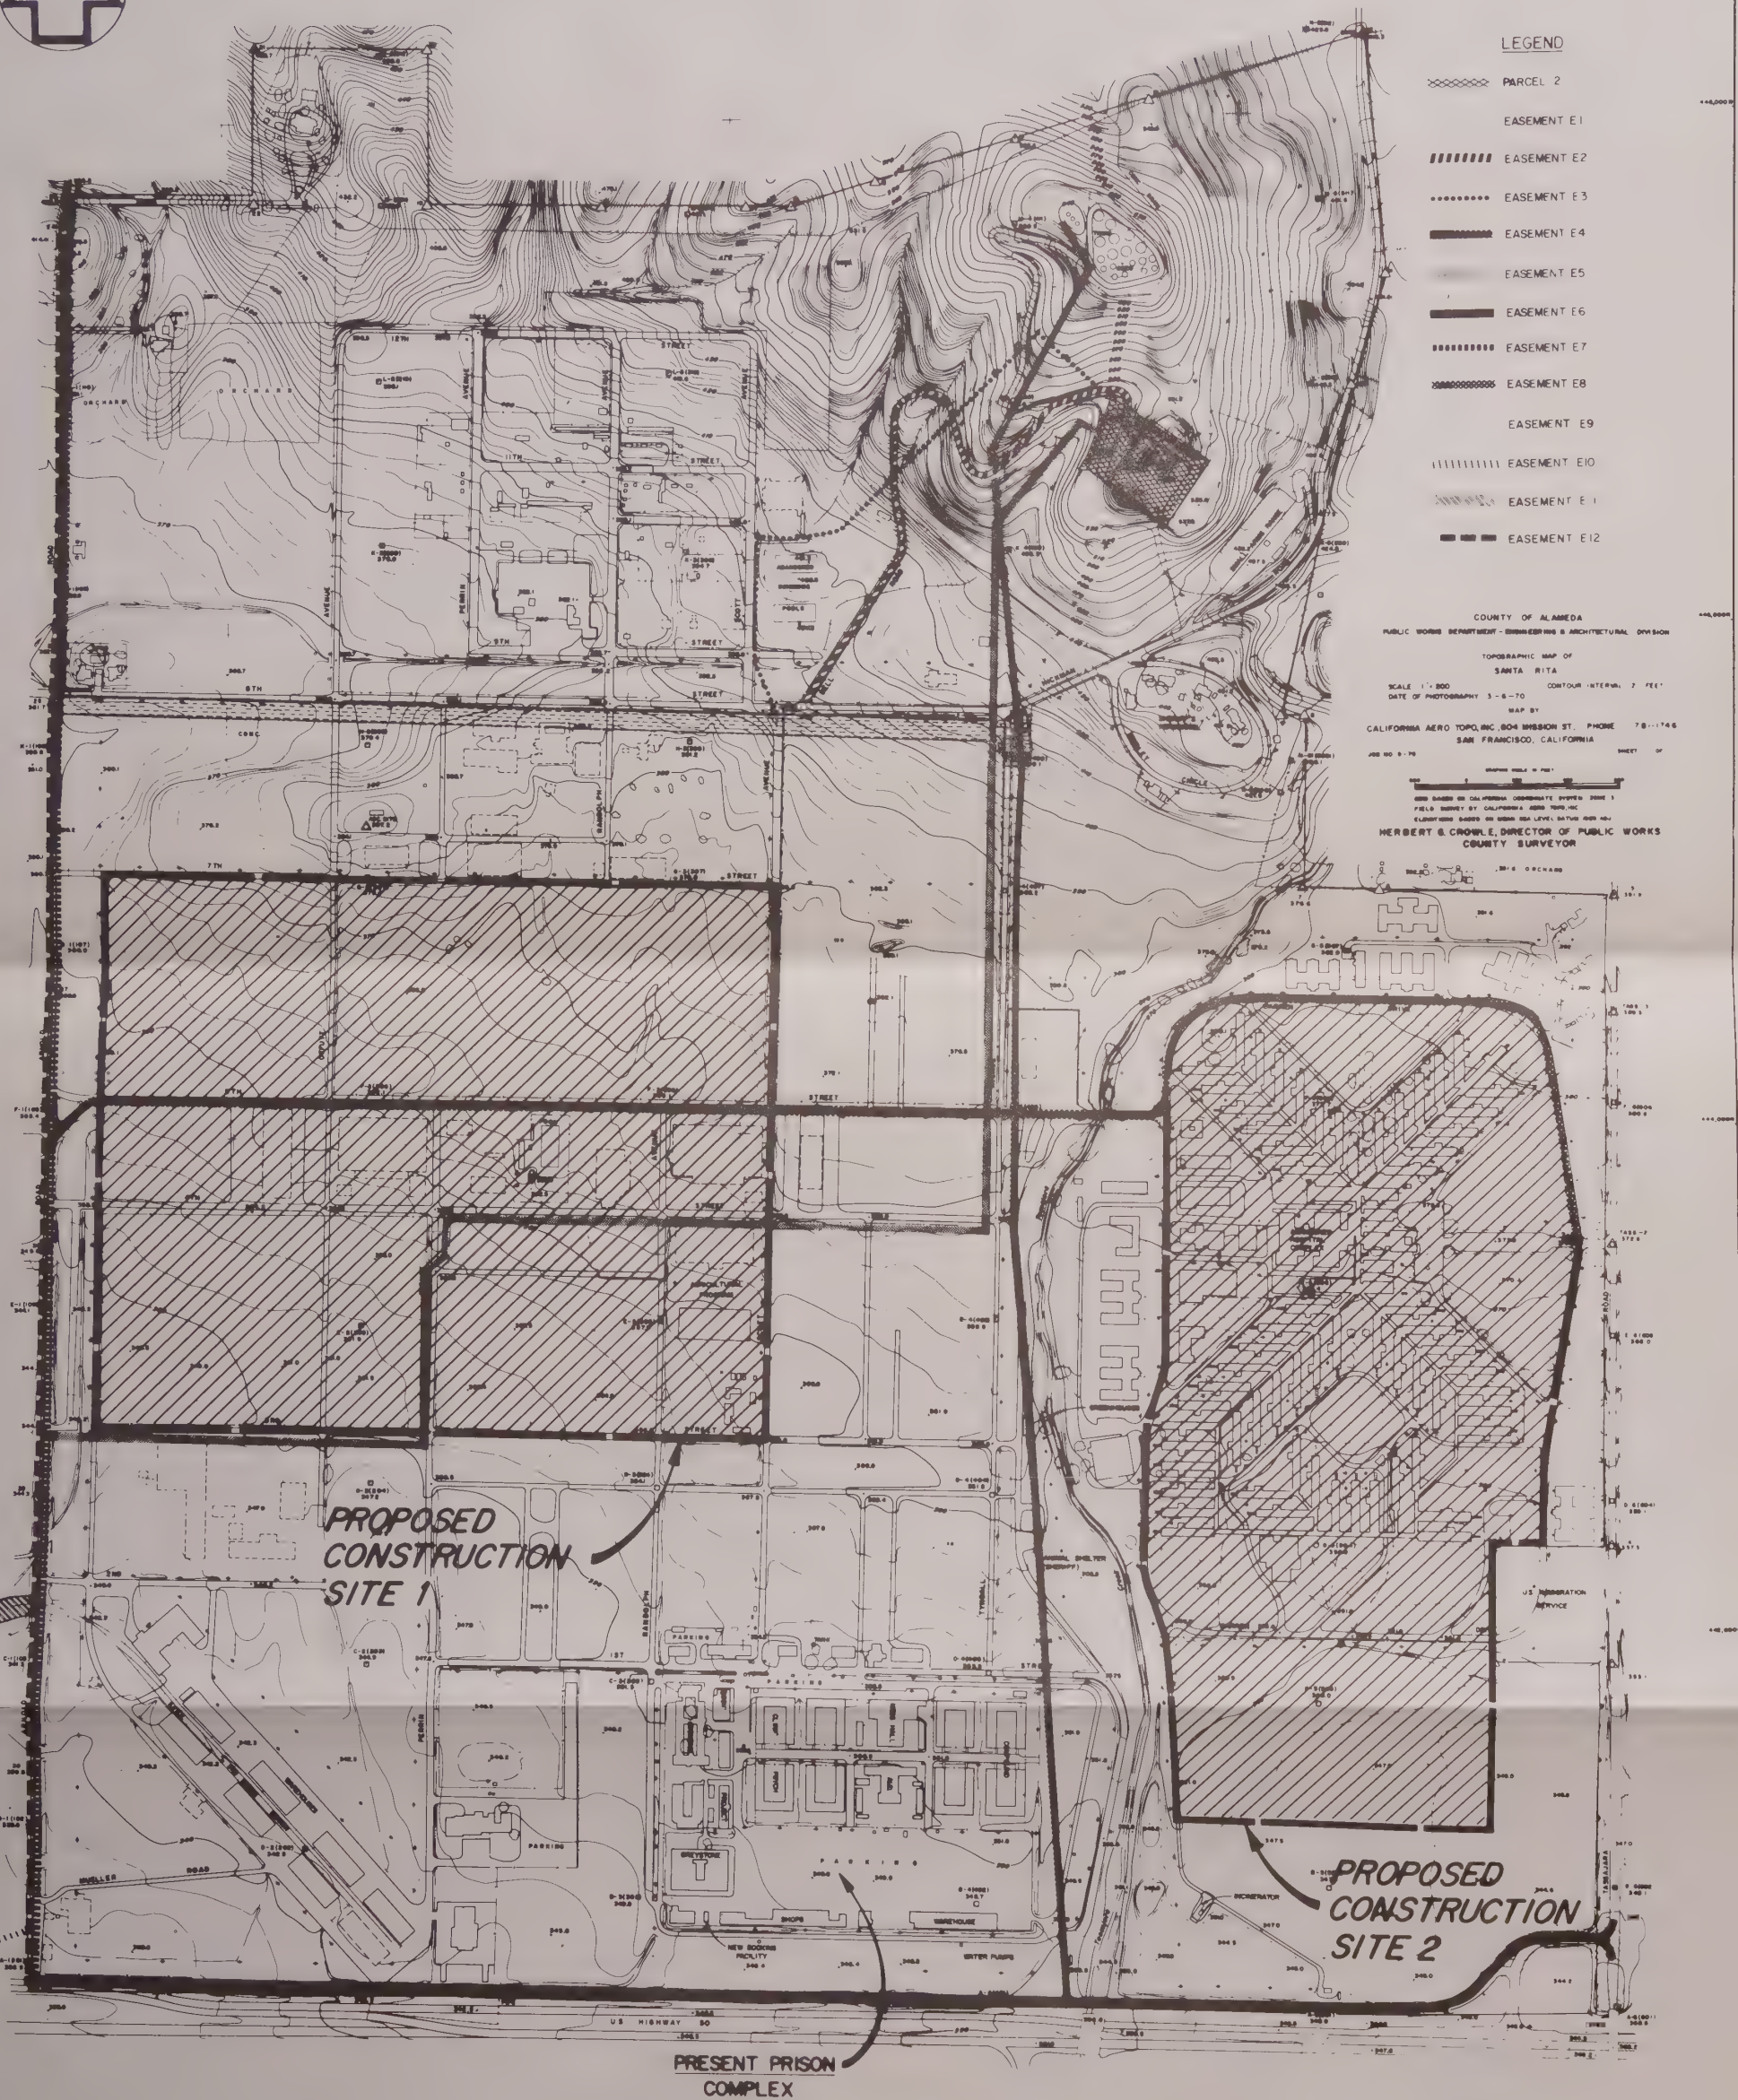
EXISTING EASEMENTS AND PROPOSED CONSTRUCTION SITES
